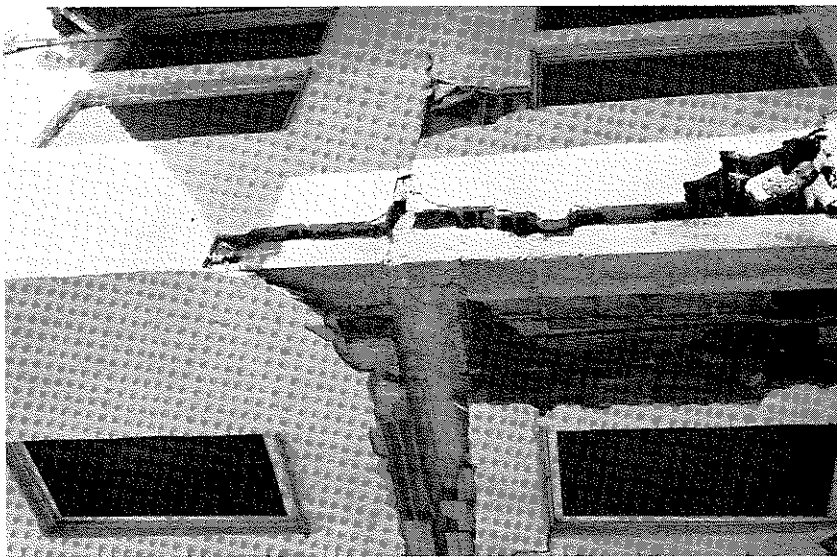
53 Beam-to-column connection, Infirmary Building (Bldg. 5), Veterans Hospital.
